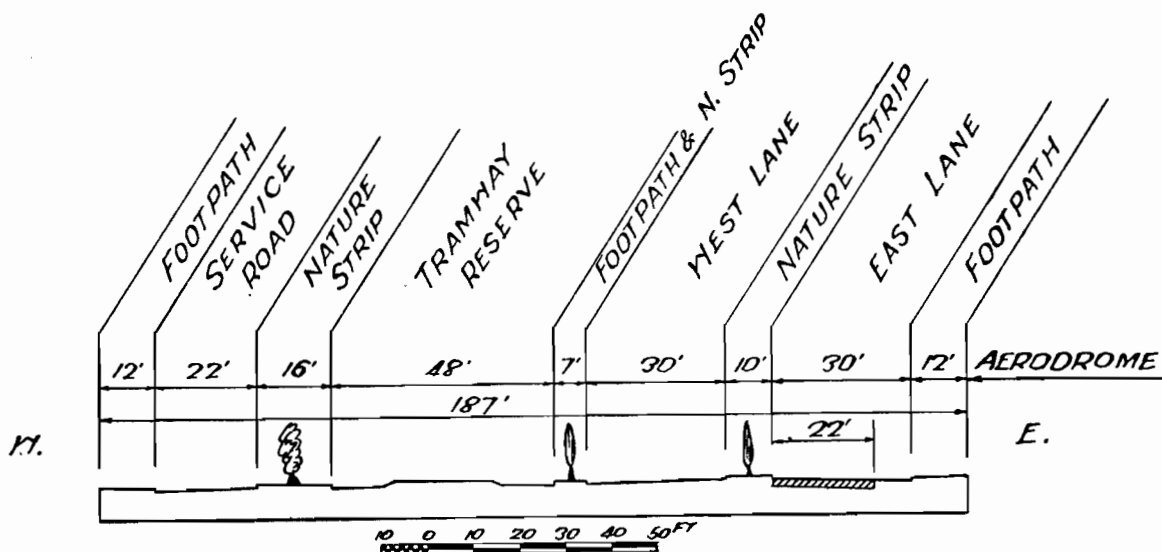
Cross-section of new Lancefield-road opposite aerodrome. (The part of the pavement shown hatched has been completed in the first stage of construction.)
